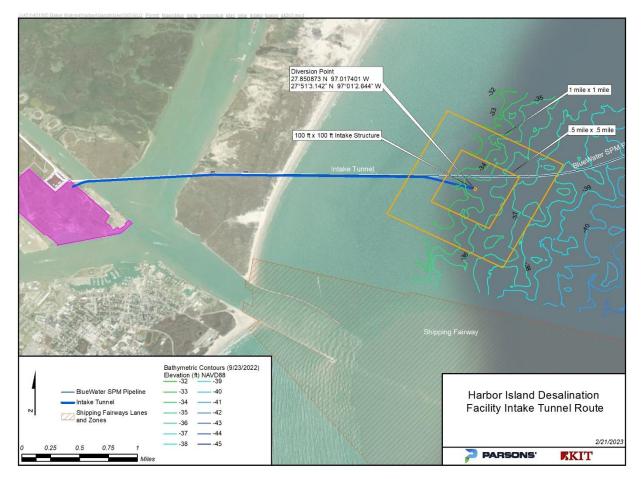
Alignment of Proposed Seawater Intake Tunnel
